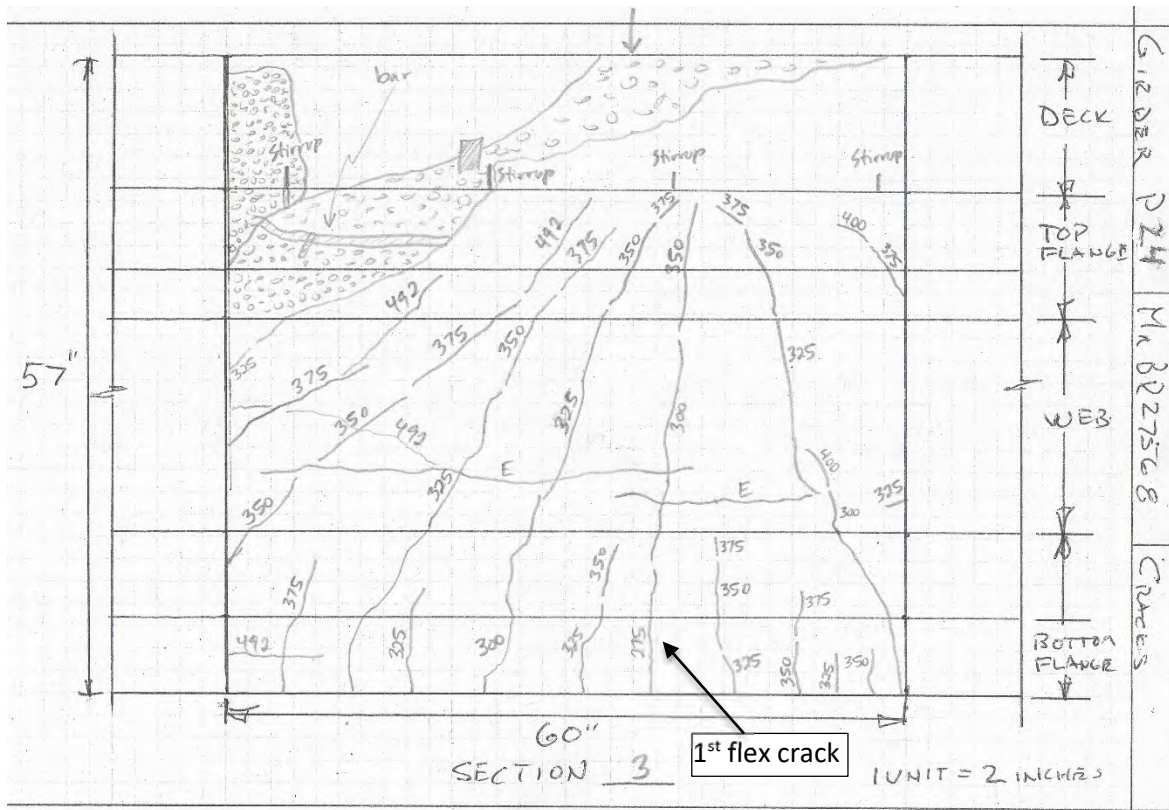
Girder P24 crack pattern – Section 3 (first flexural crack at 275k)
